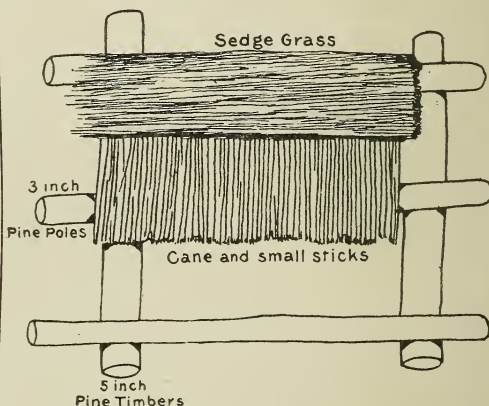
Sketch showing structure of earth-lodge roof, Mound 9, Washington site
